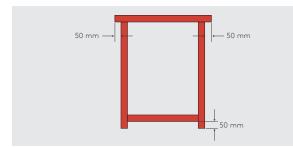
Kingspan Kooltherm $^{\otimes}$  Cavity Closer sill, jamb & head sections
